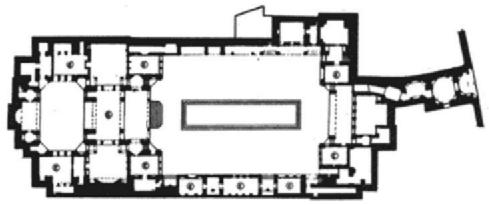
The ground floor plan of "Borujerdie's house" located in Kashan [8].
